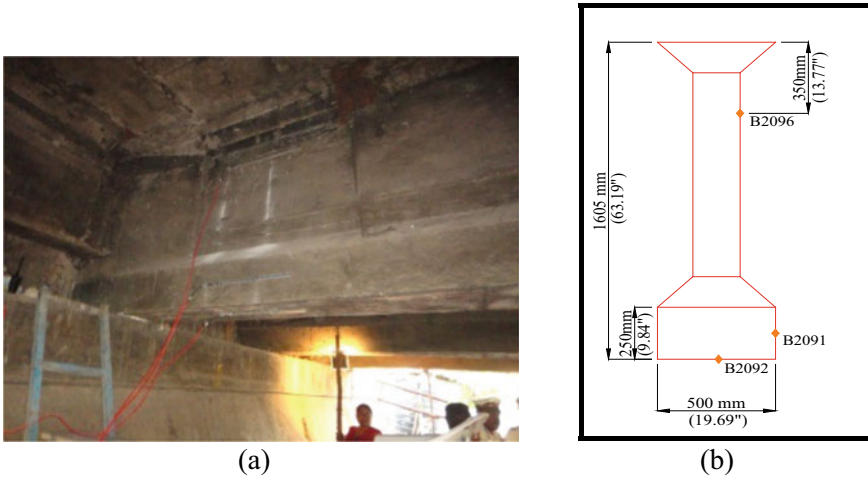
a, b Arrangements of strain gauges in the longitudinal girder
